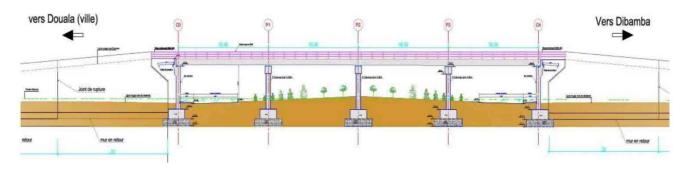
LONGITUDINAL SECTION OF THE REINFORCED CONCRETE DECK
